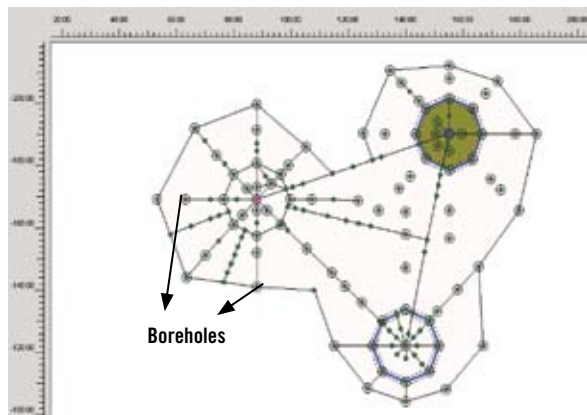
3D FE structure-foundation model, 2D build-up, horizontal plane at S1 level, -14.5 m
